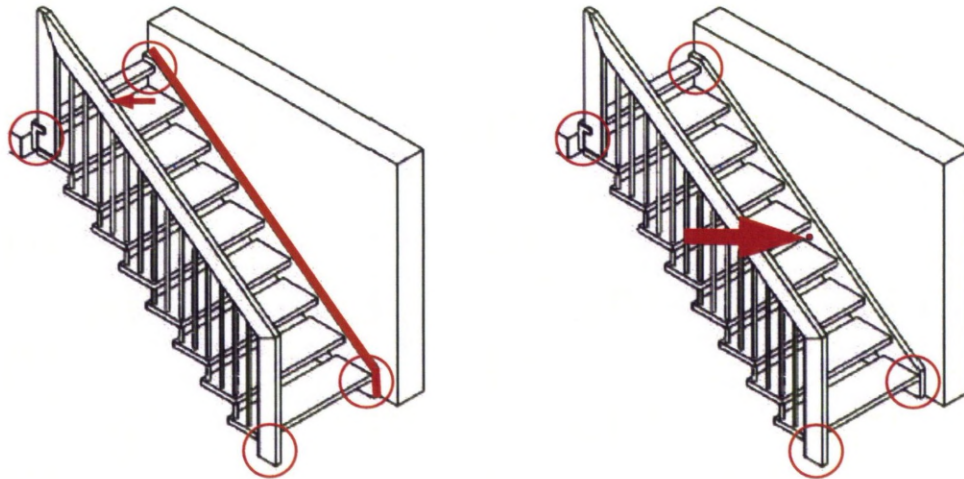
Contact points of lightweight stair systems with the building: left: string-board directly connected to wall; right: string board distanced from wall with point connection
